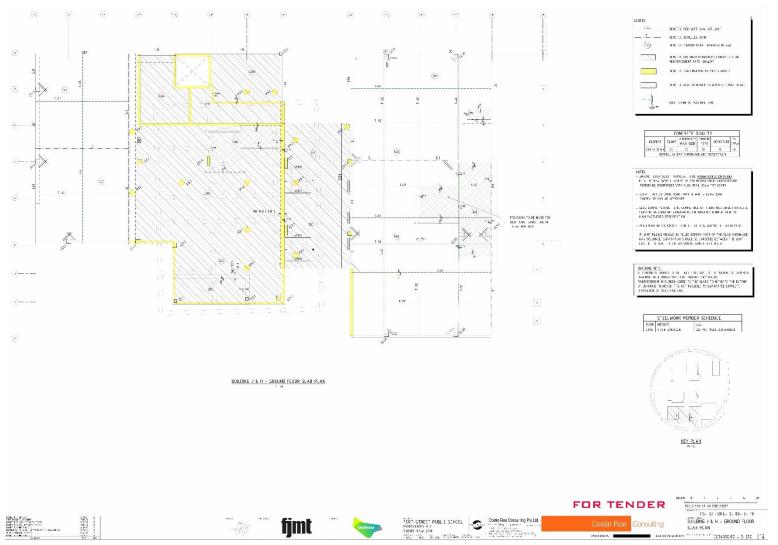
Building J and H ground floor slab plan. (Source: Lendlease, 2021)
